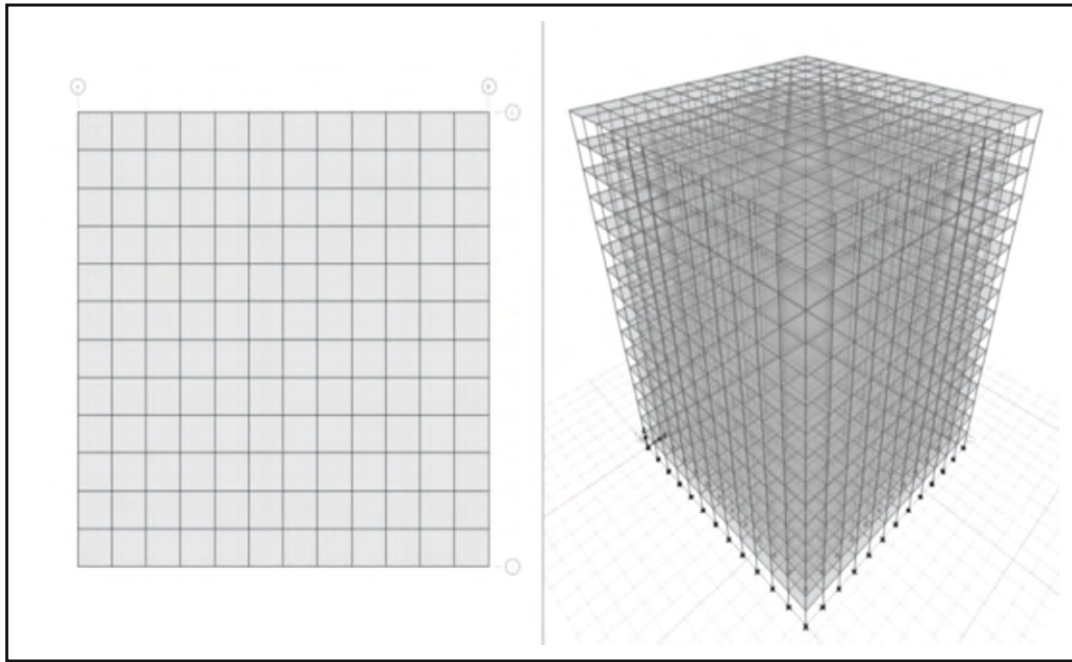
Plan and 3-D view of Square Diagrid Building
